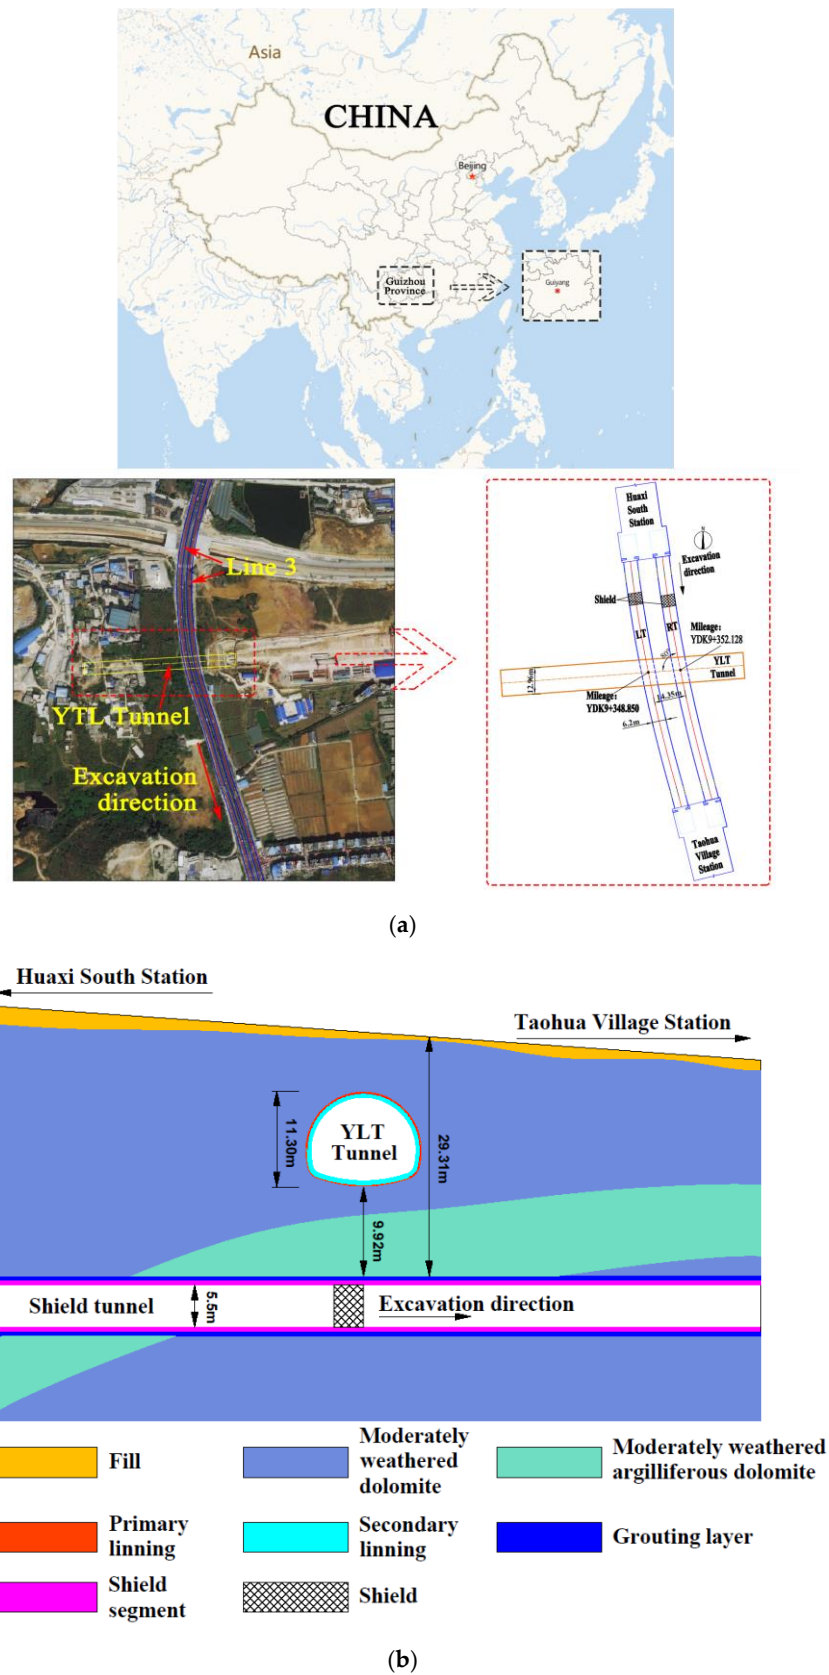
Spatial location of the existing YLT Tunnel and the new tunnel: (a) plan view; (b) geological profile.
